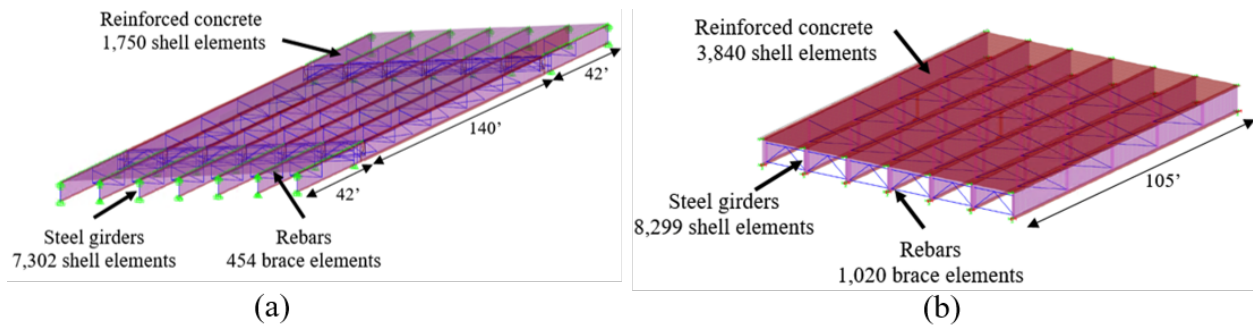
The CSiBridge models for: (a) Telegraph Road Bridge and (b) Newburg Road Bridge.
